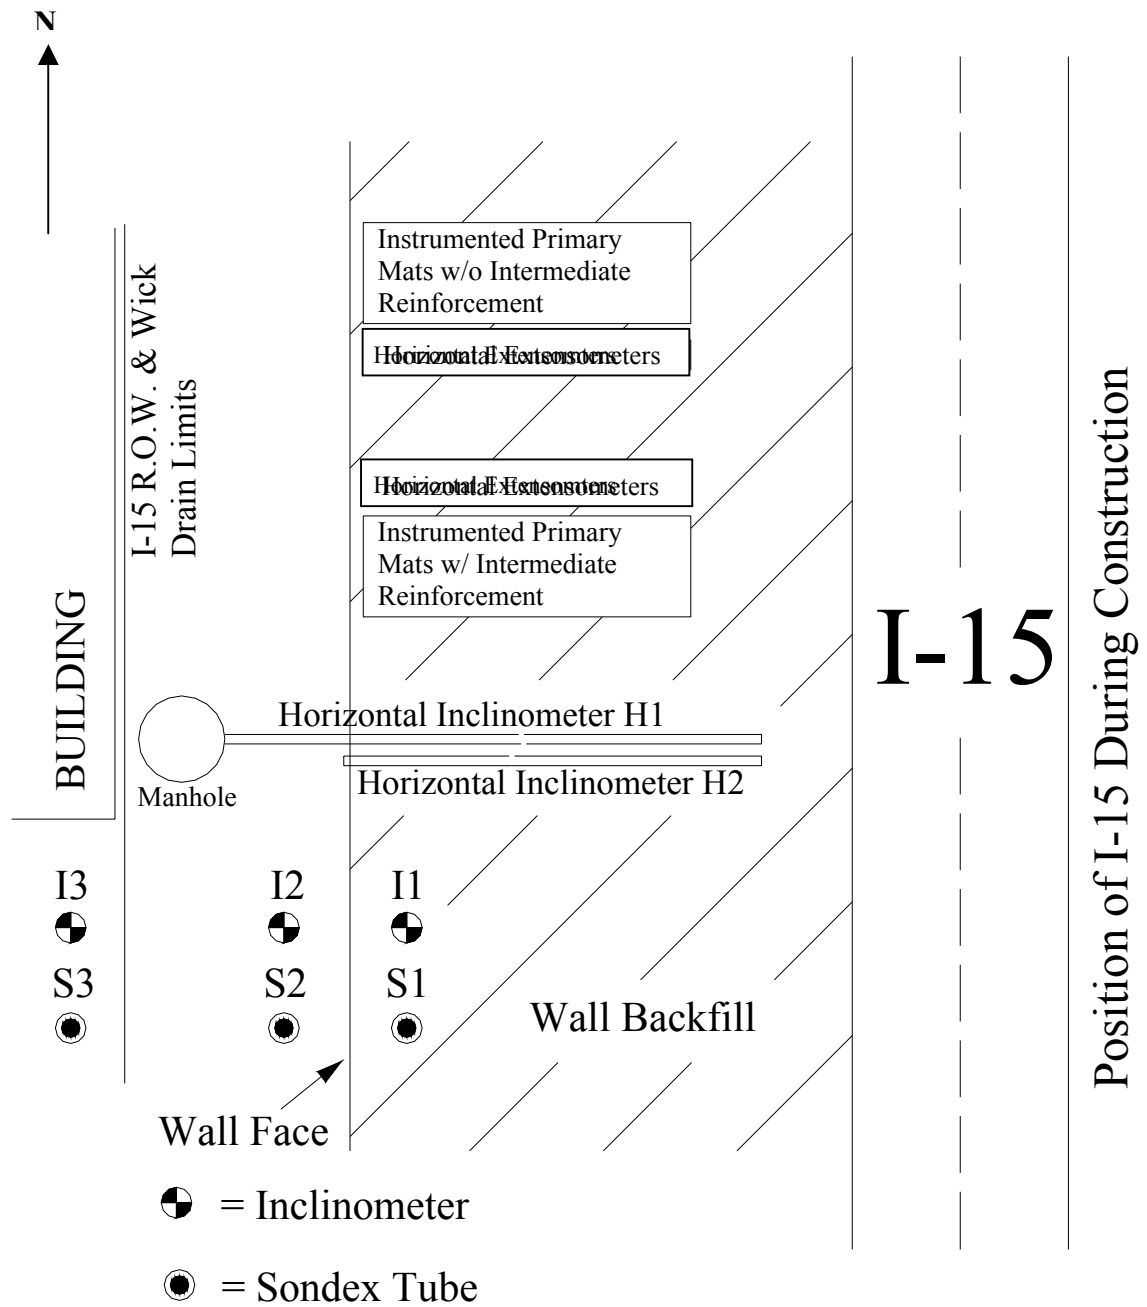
Plan view of the two-instrumented sections of wall with instrumentation.
